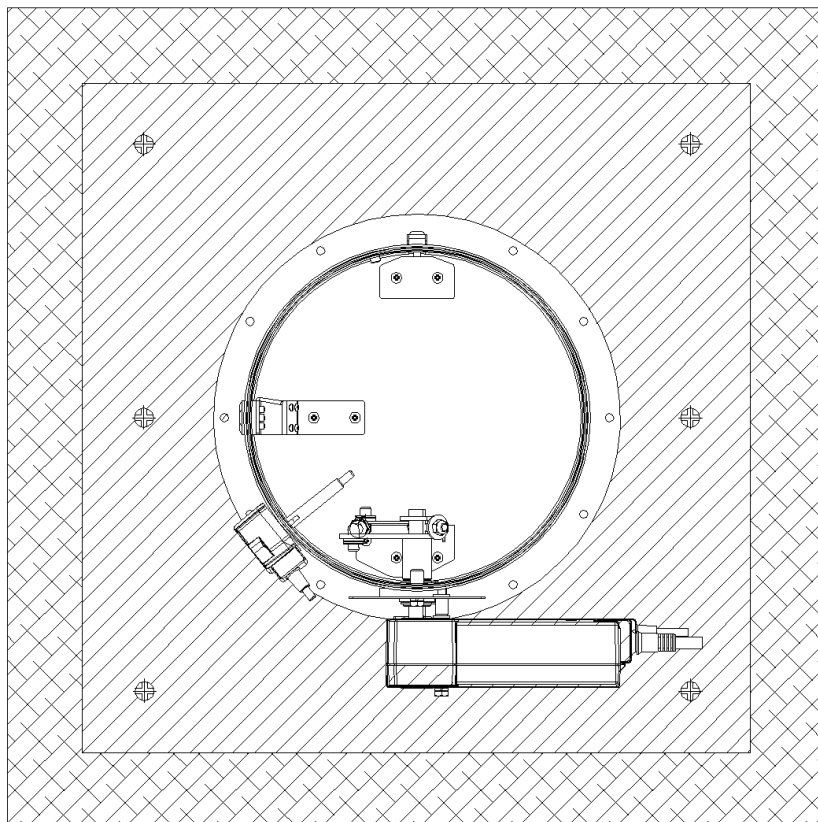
Installation method of fire dampers KTS-O in flexible wall with vertical rotation axis of baffle
